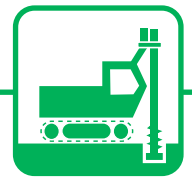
Boreholes and piles should be outside the Critical Zone and should be checked for potential impacts on Railway structures
